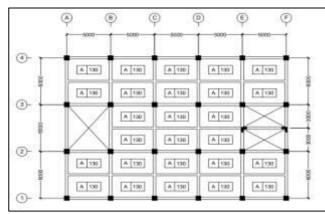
1st = 2nd = 3rd Story Slabs Plan
